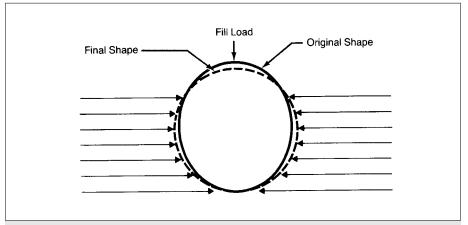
Corrugated steel pipe functions structurally as a flexible ring that is supported by and interacts with the compacted surrounding soil. The soil constructed around the pipe is thus an integral part of the structural system. Therefore it is important to ensure that the soil structure or backfill is made up of acceptable material and that it is well-constructed.
